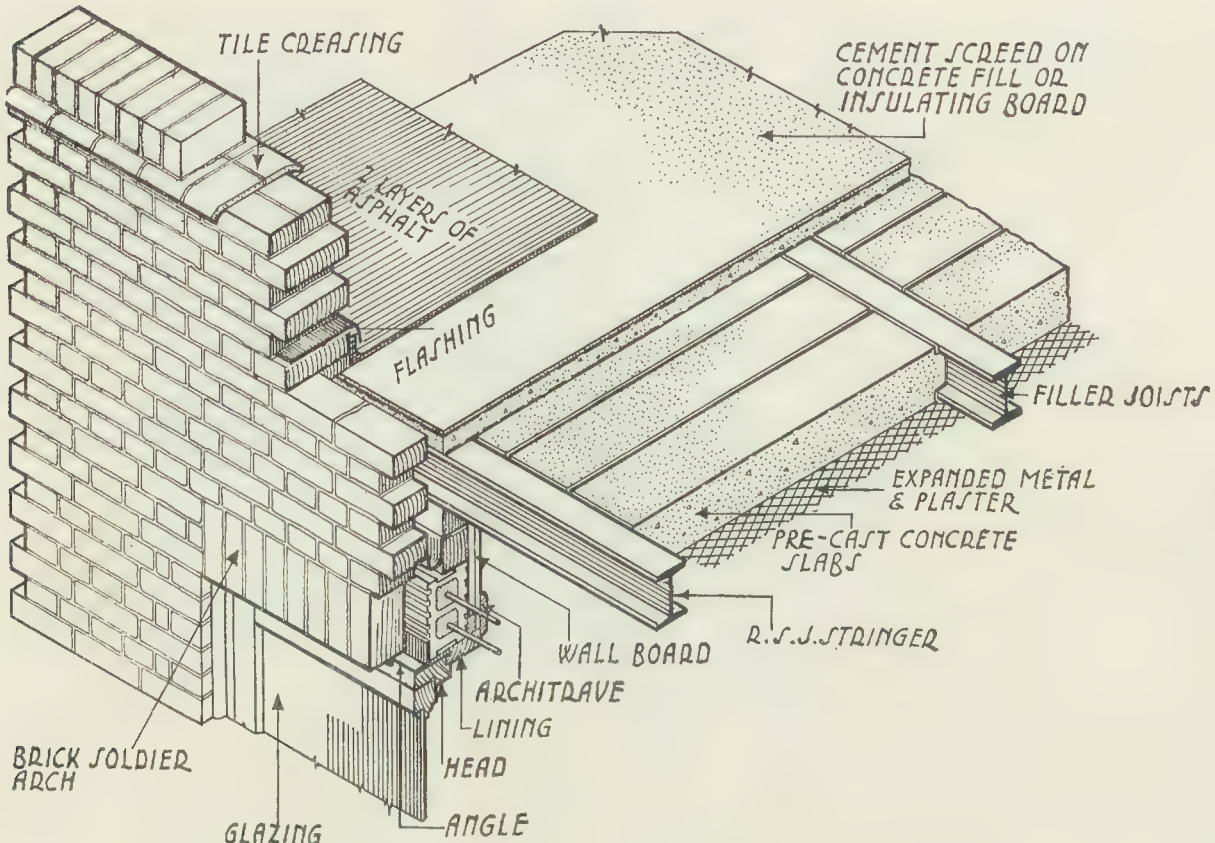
BRICK SOLDIER ARCH SUPPORTED UPON A STEEL ANGLE SECTION
